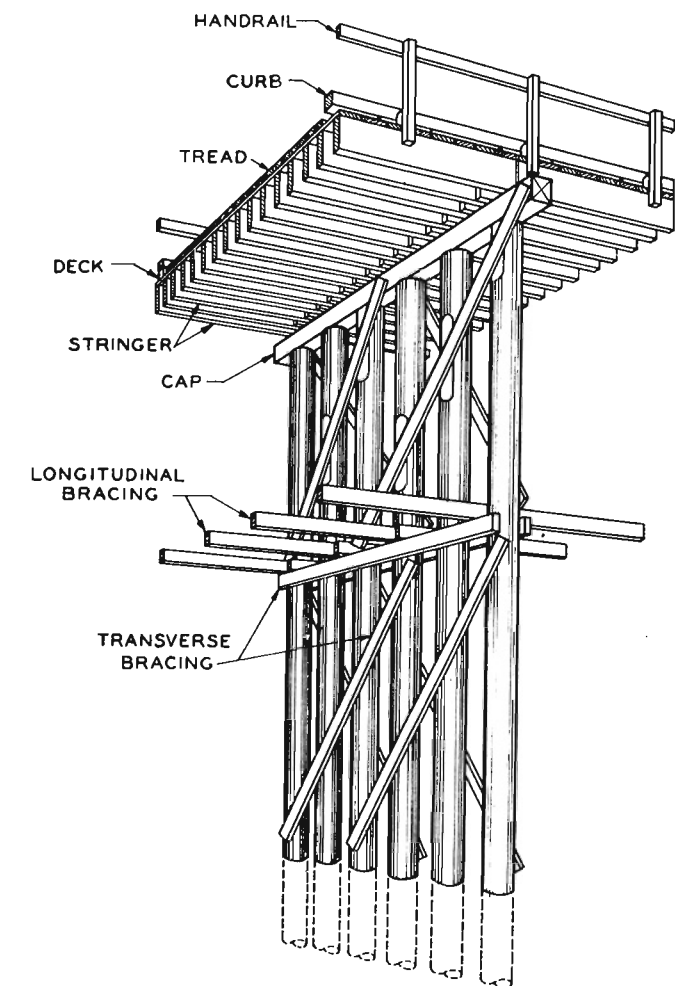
Highway bridge, class 50, double-lane, timber stringers on timber pile bent.
